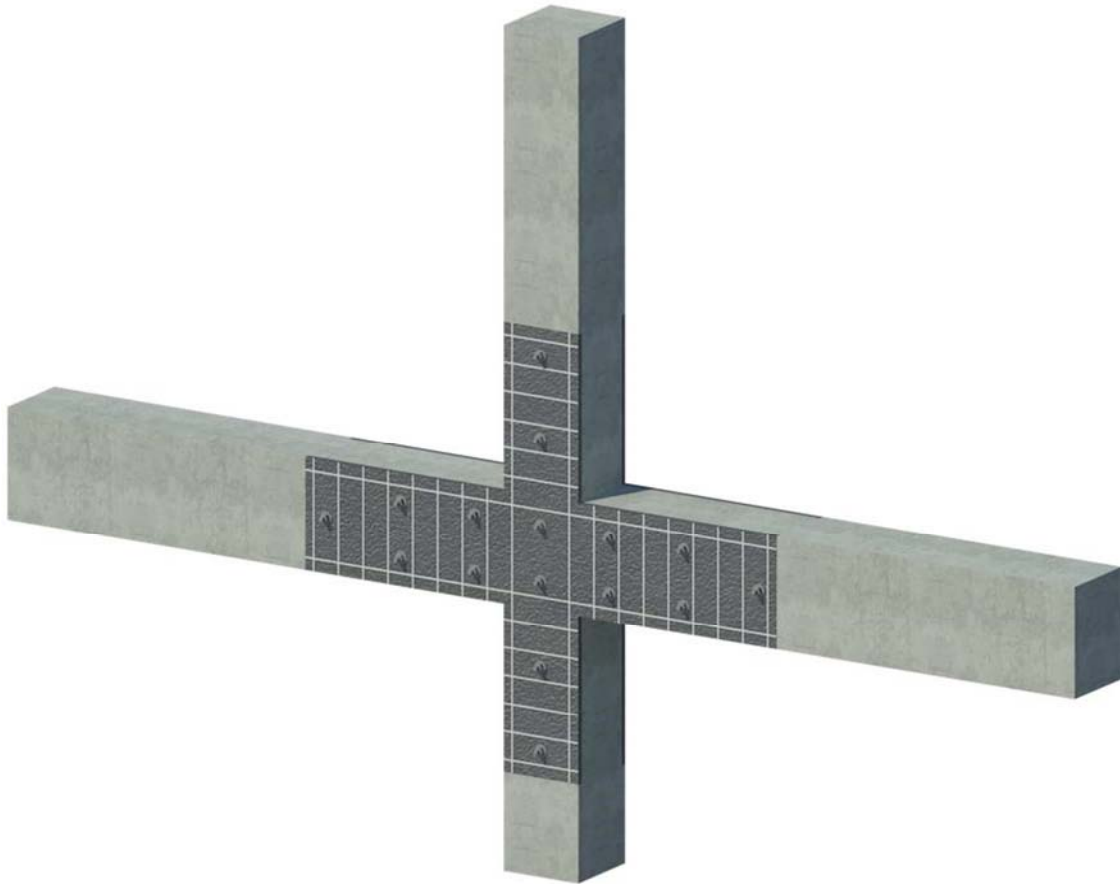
3D view of JPA-3 joint after the precast retrofitting
